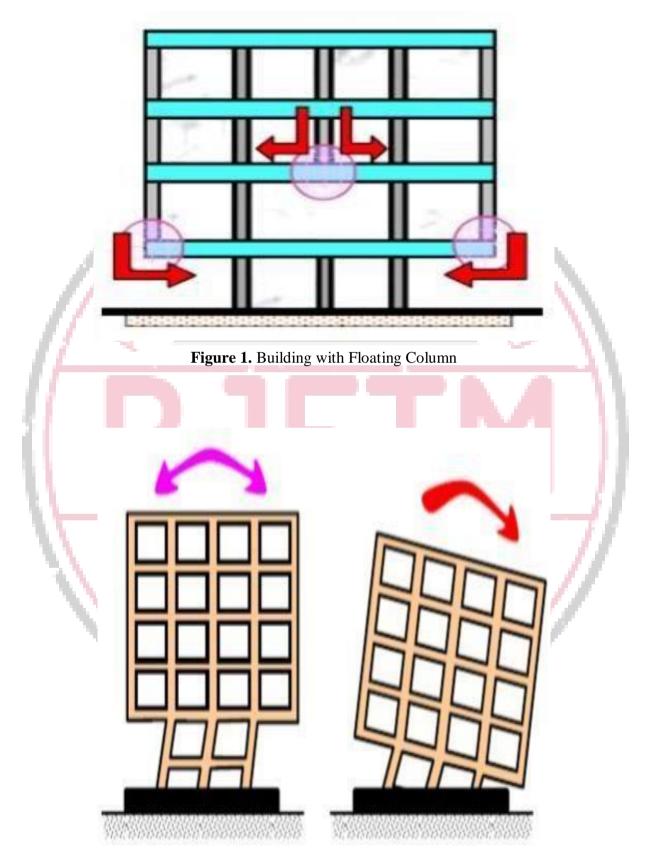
Buildings with floating columns: Overloading of columns in ground storey cause failure of buildings with floating columns during strong earthquake shaking
